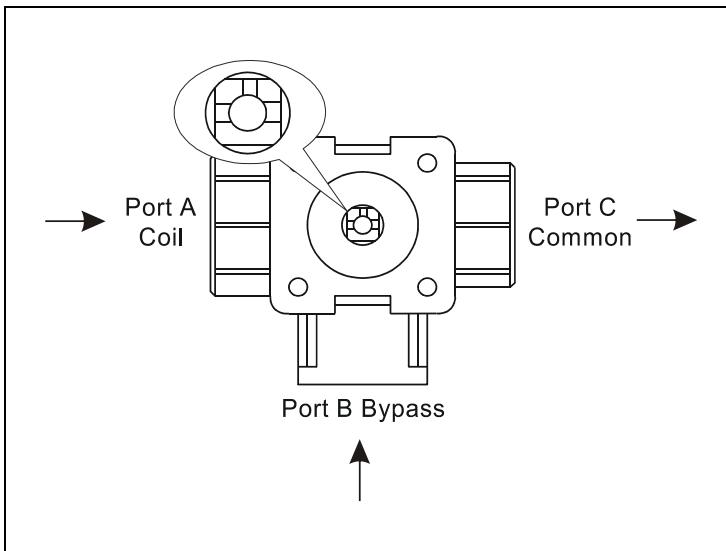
VG1801 or VG1805 Series 3-Way Ball Valve (Port A Connected to Port C)
